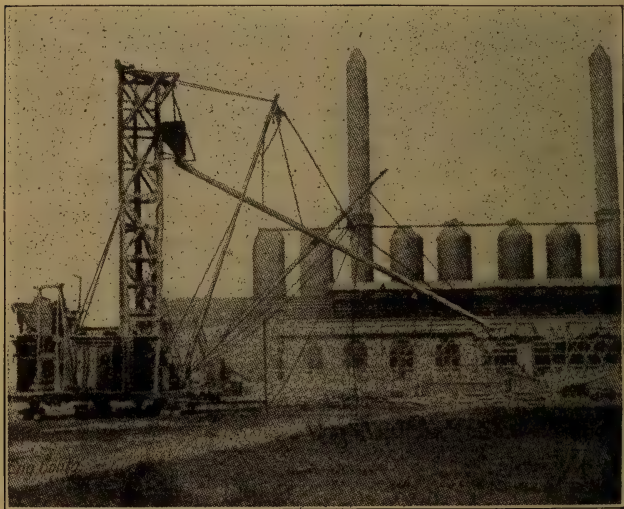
View of Portable Mixer and Conveyor Used for Massive Foundation Work.
